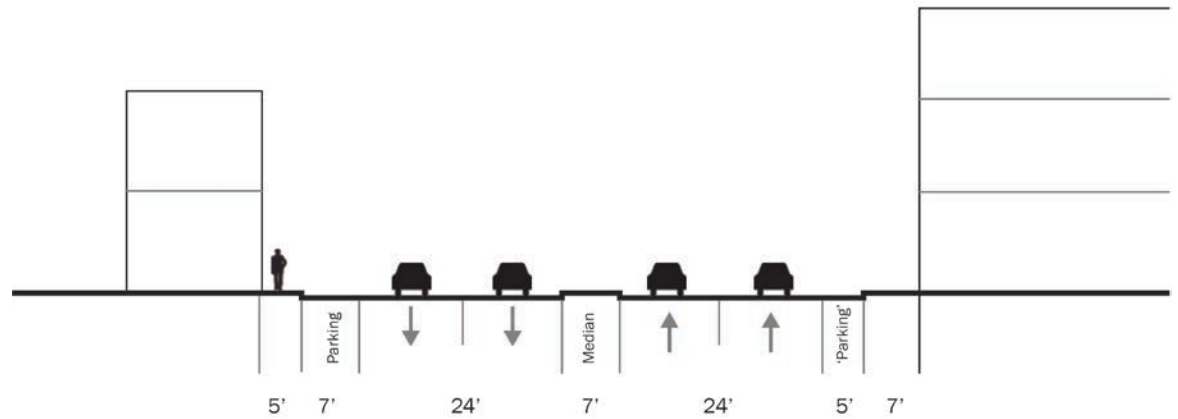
Section of potential Complete Streets lane configurations on Boylston Street from Cypress Street to Davis Path.
